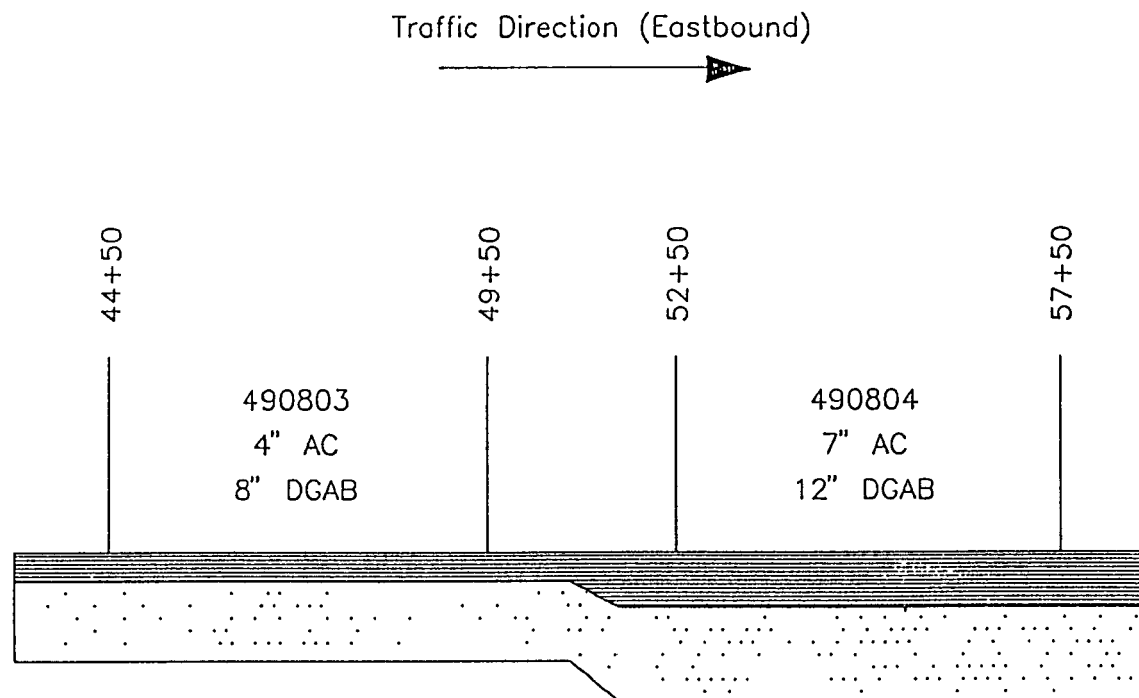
Layout of experimental test sections, Utah SPS-8 project, S.R. 35.
